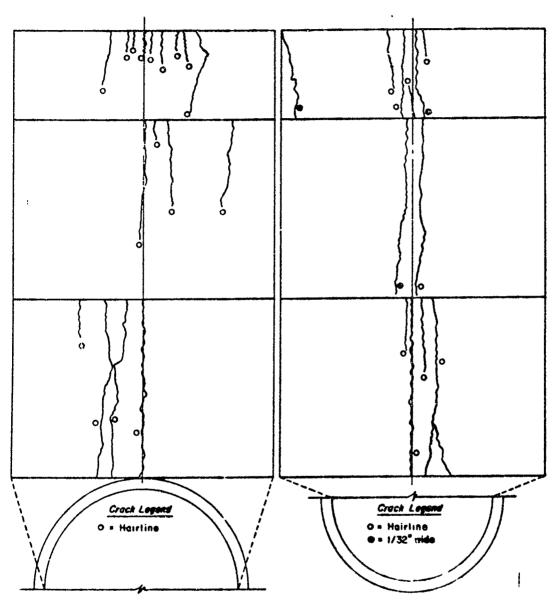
Crack survey of top half, developed; concrete Conduit 3.2j.
